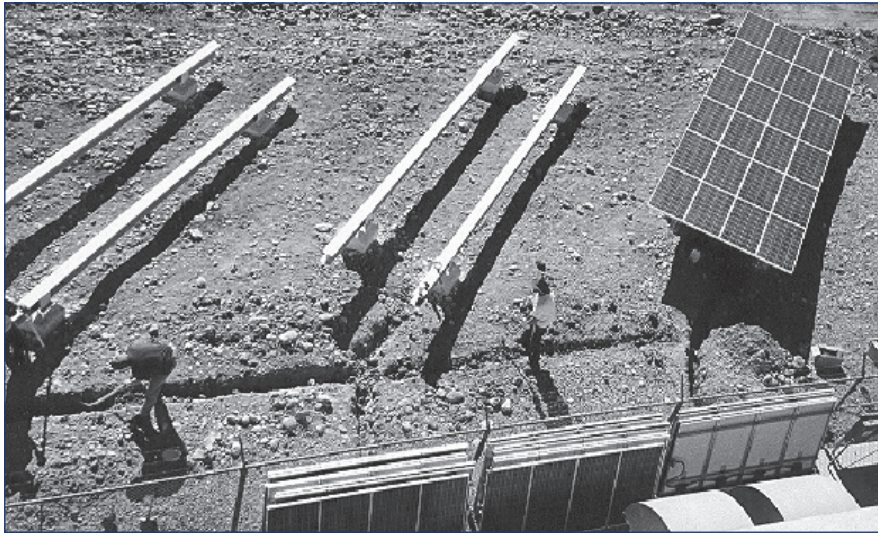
Aerial view of mounting structure showing I-Beams on concrete footings.
